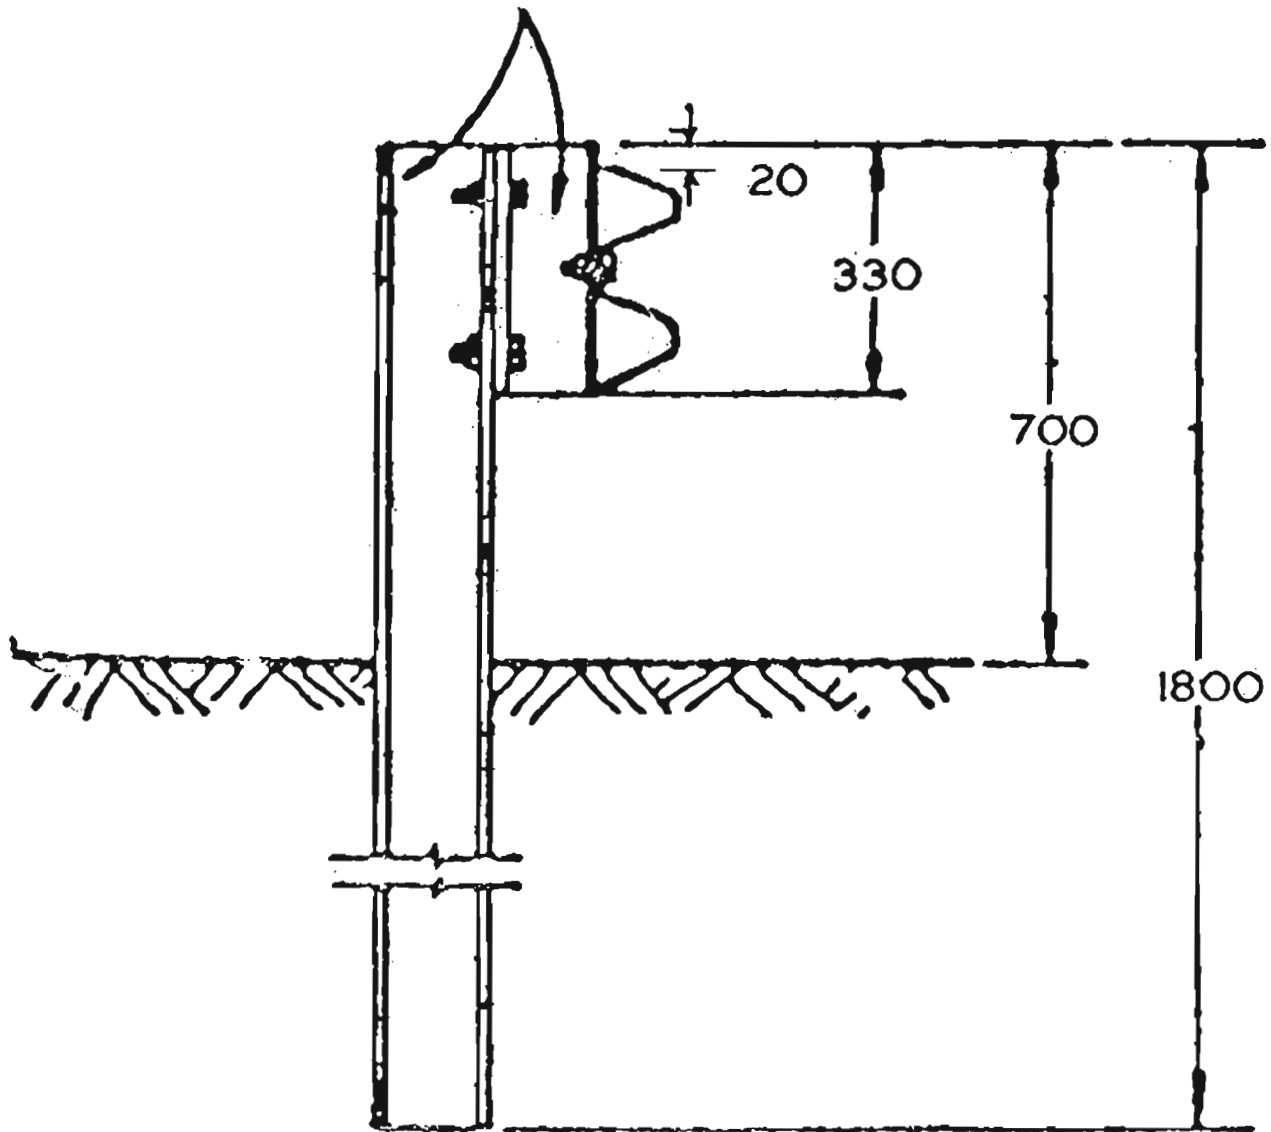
TYPICAL DETAILS OF 'W' BEAM SECTION
